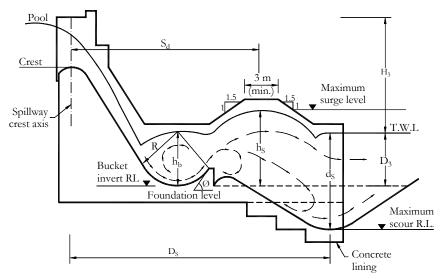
Definition sketch for top profile of training wall and scour and surge distances
